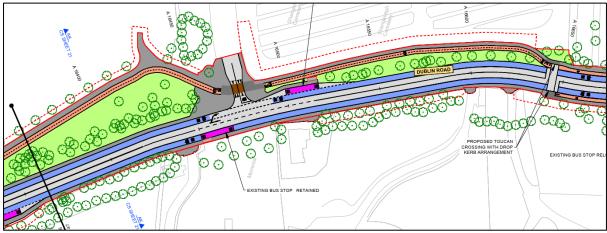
Extract from General Arrangement Drawing at Shanganagh Park/ Cemetery (Sheet 47)
